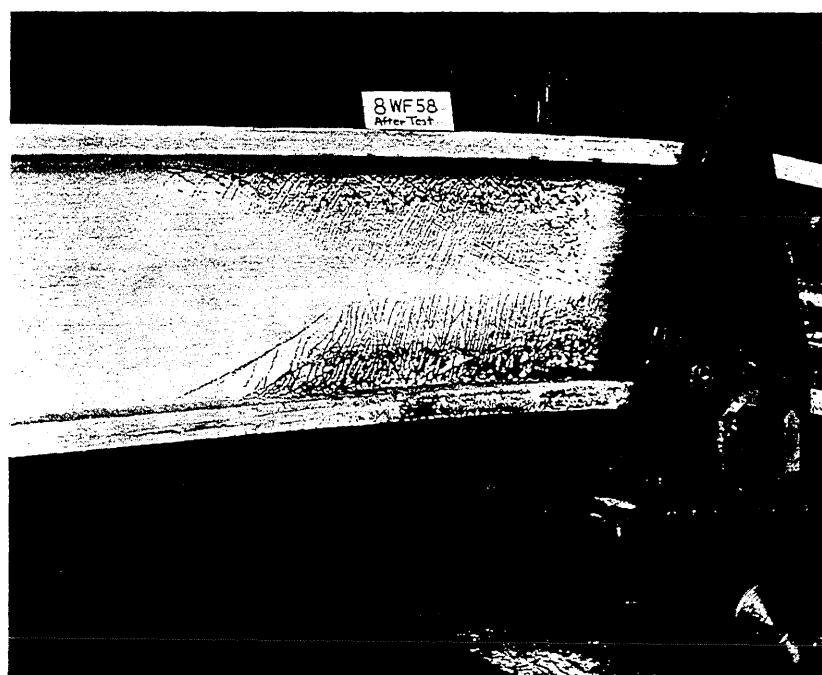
BEAM B1 - CANTILEVER SECTION - AFTER TEST
